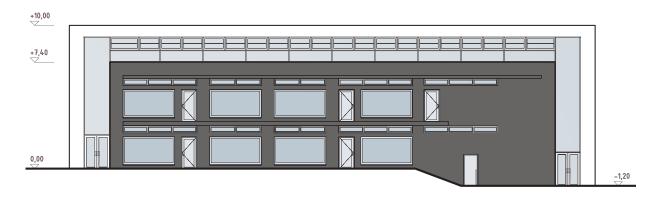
FACADE TOWARDS EAST, SCALE 1:250.
